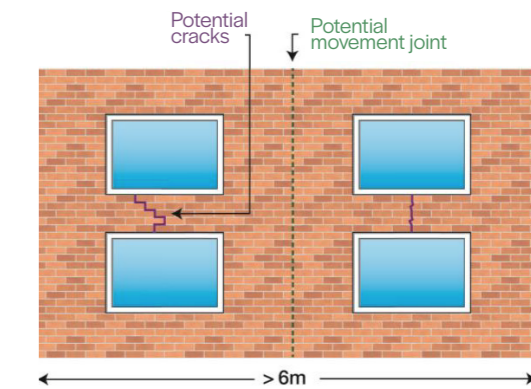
A long uninterrupted run of brickwork between upper and lower windows can lead to cracking at the smallest height, i.e. between the windows either as shown or from the corners of the windows. Cracks may be vertical or stepped – they follow the line of least resistance.
